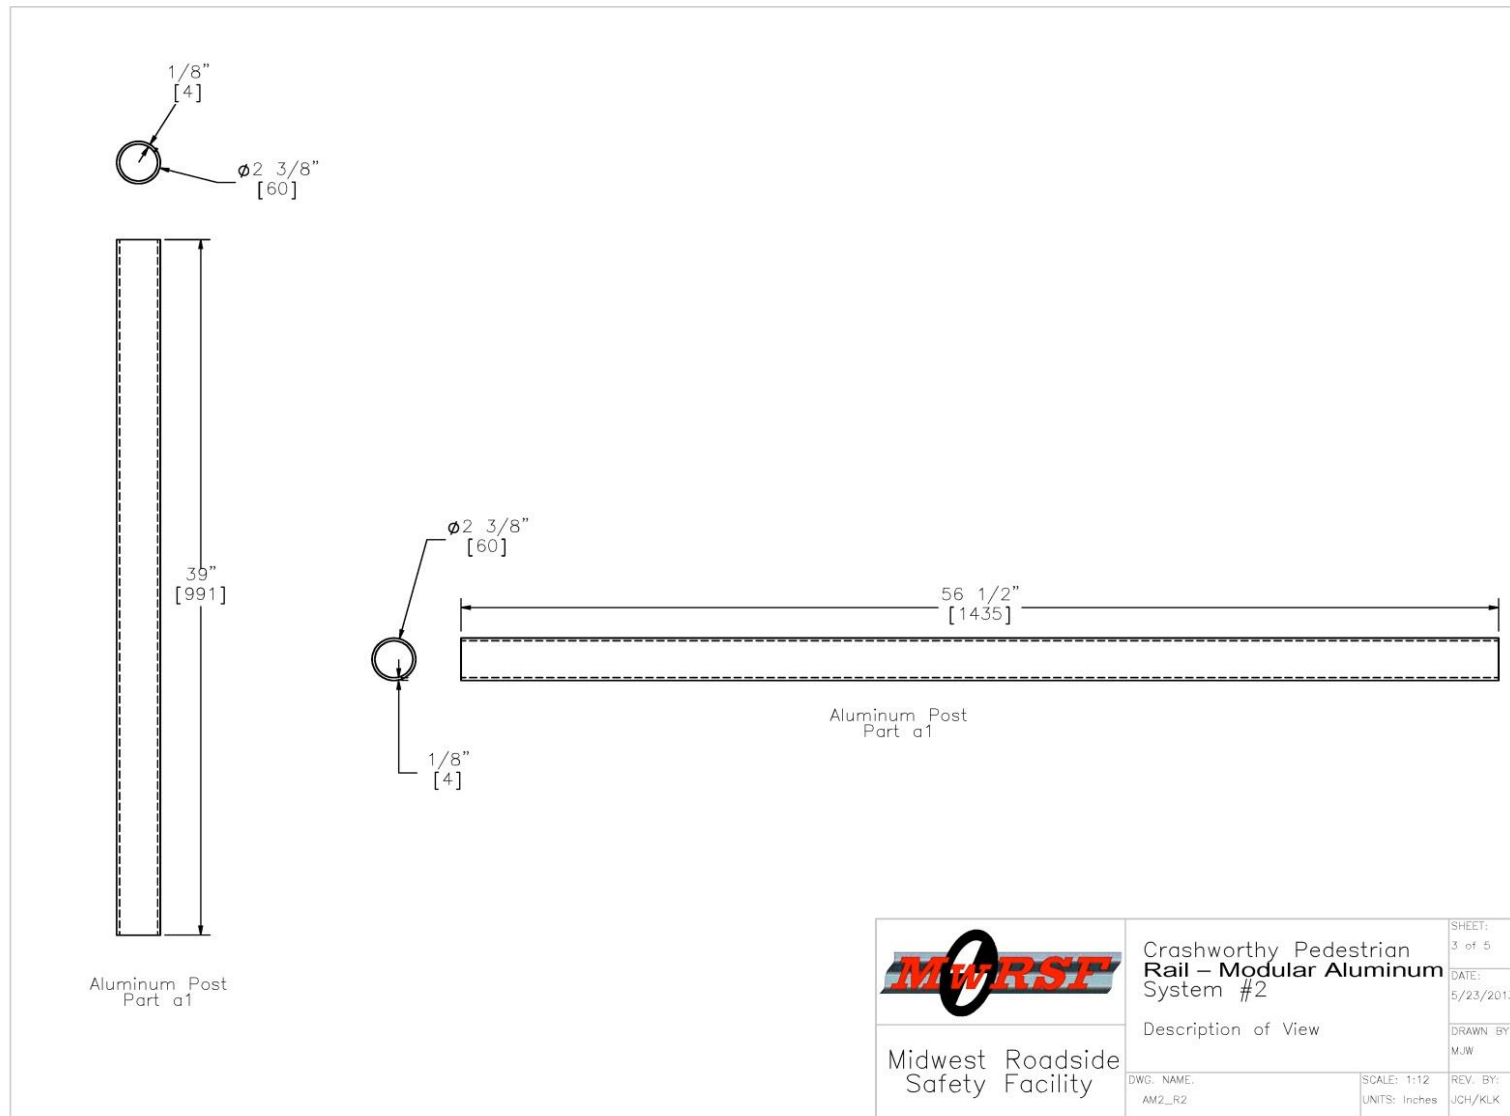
Aluminum Modular Rail with Wire Mesh, Design Concept AM-2 (Sheet 3 of 5)
